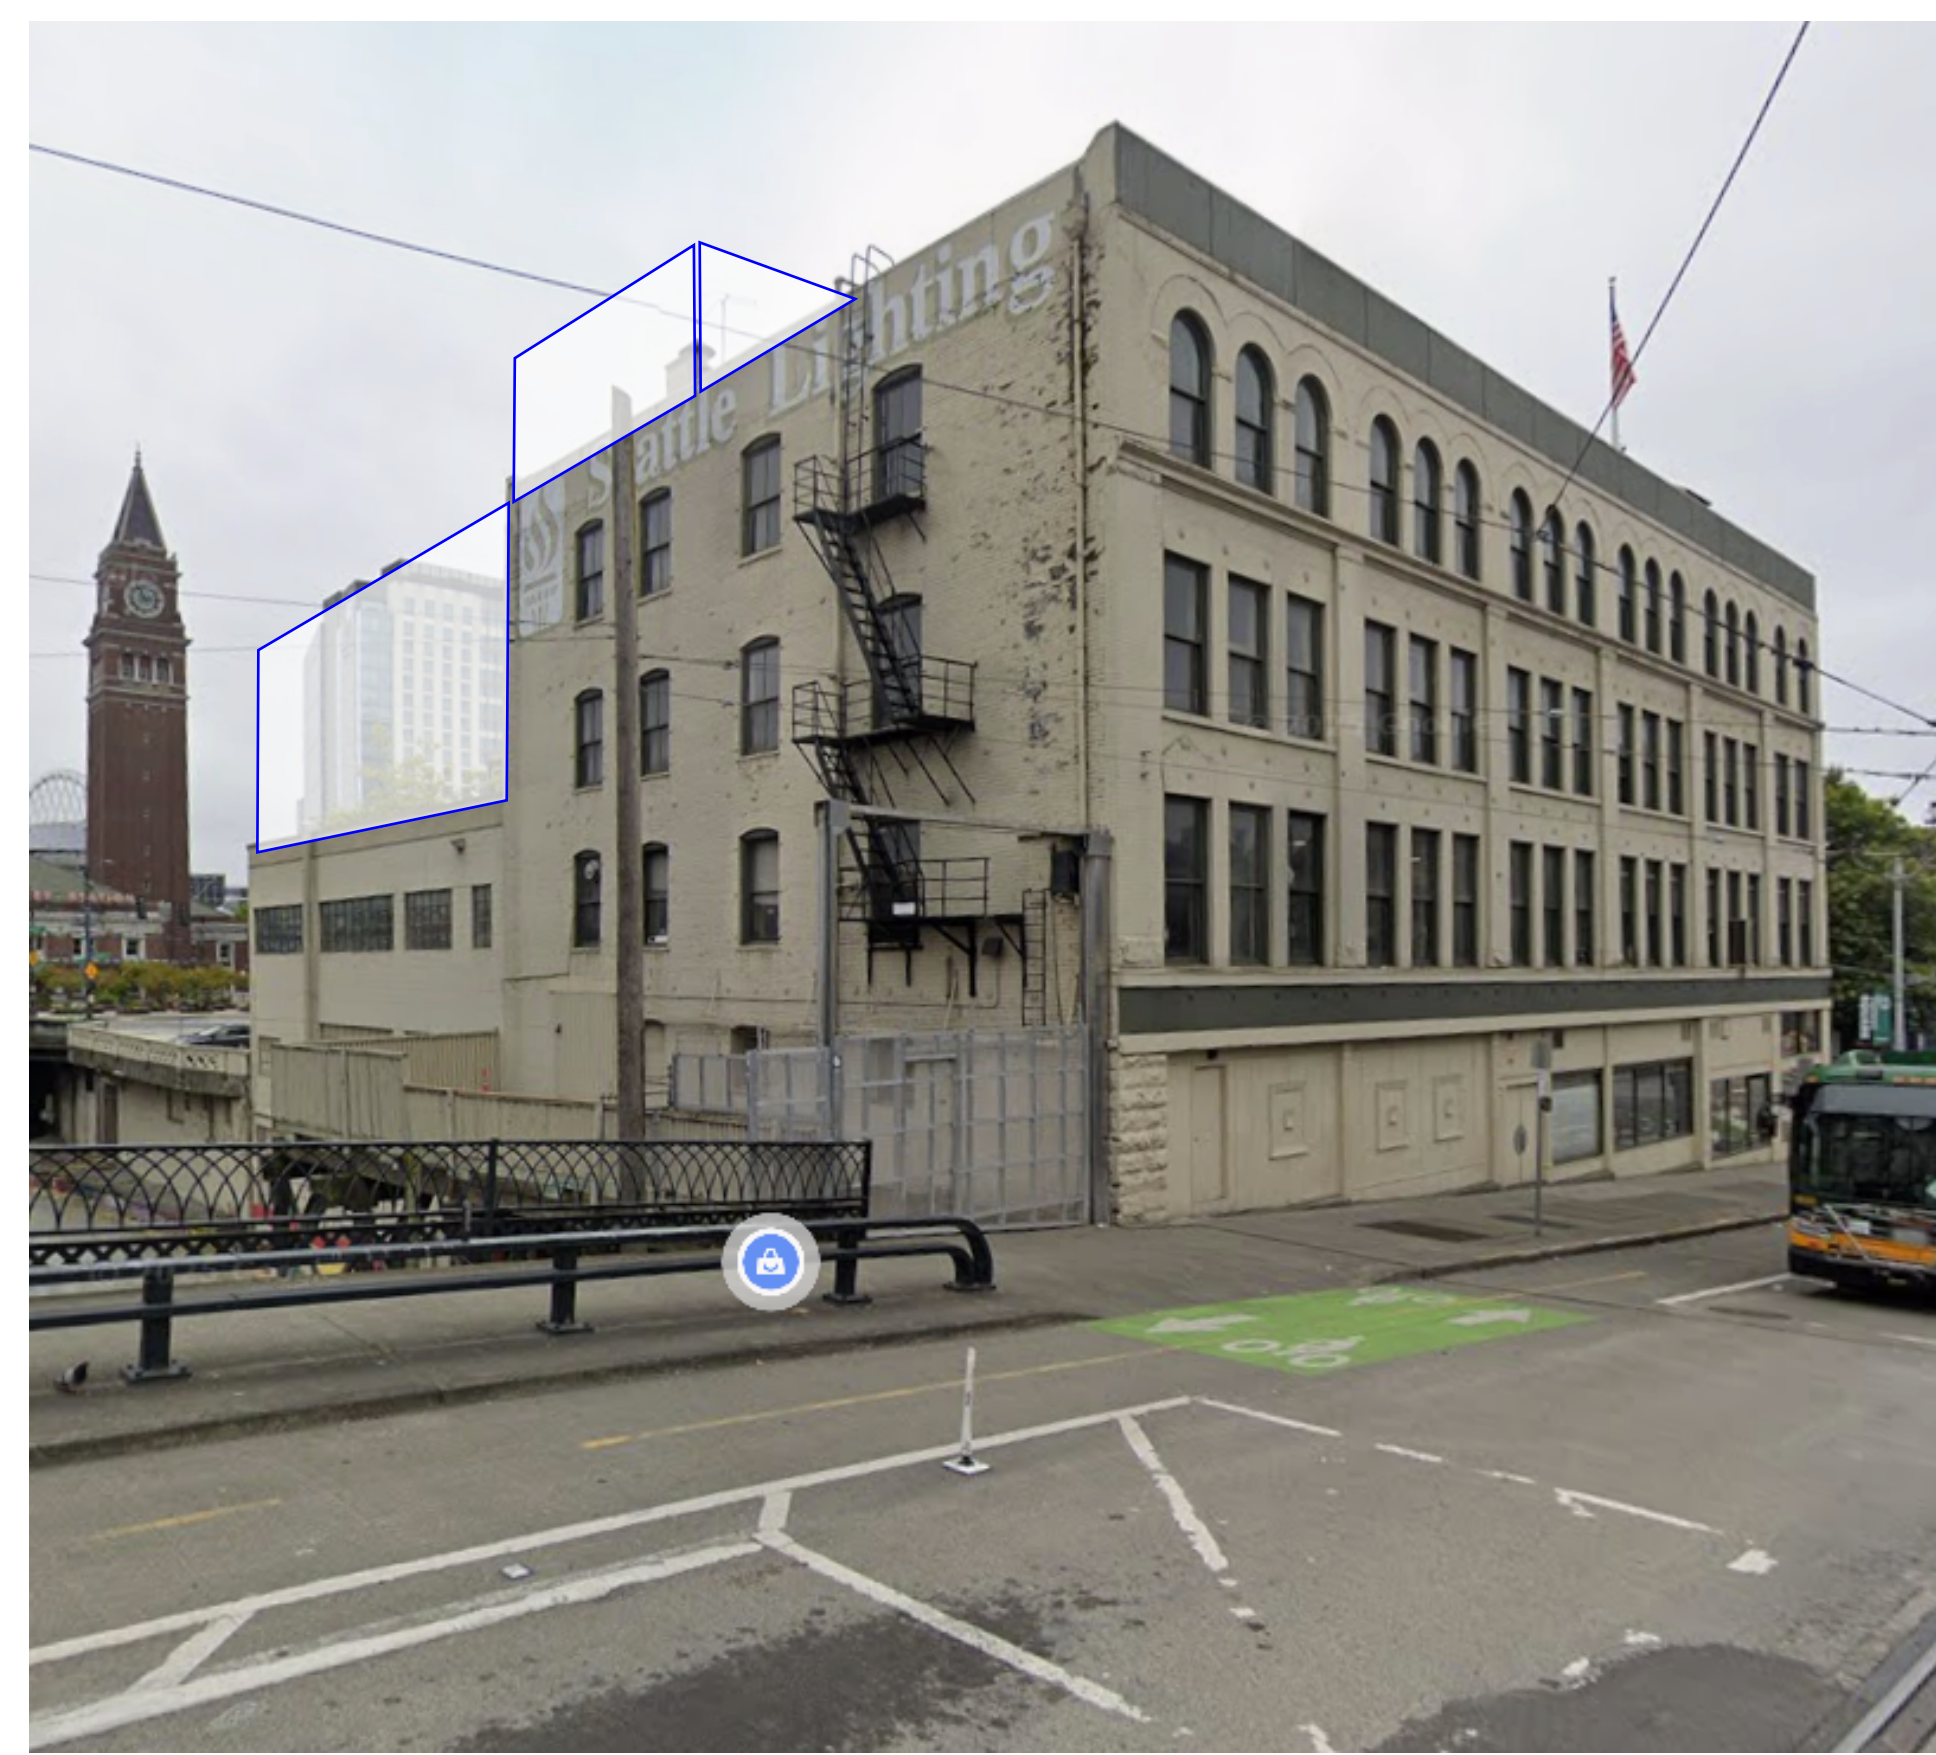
210 & 222 2nd Ave Ext. S. - Looking S.W.
